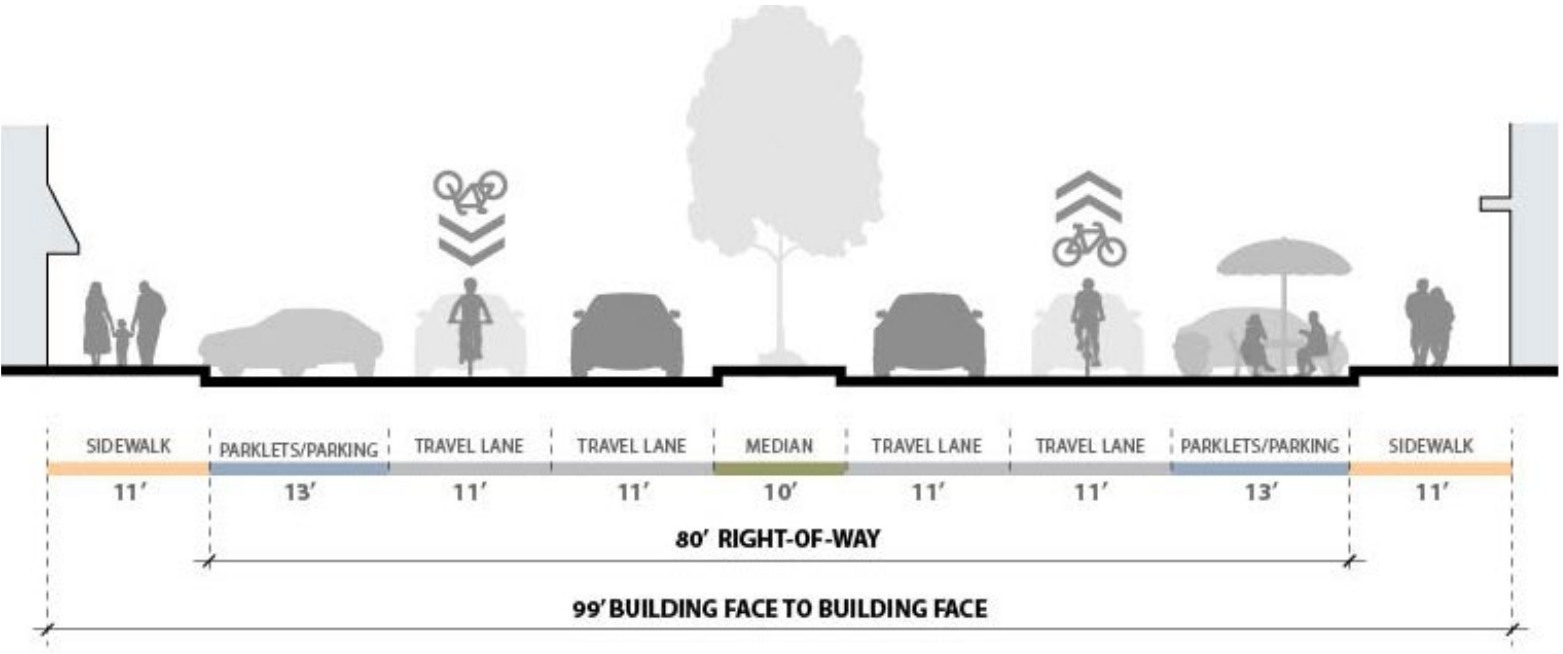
EXISTING STREET CONDITION: SAN CARLOS AVENUE (LOOKING EAST)
